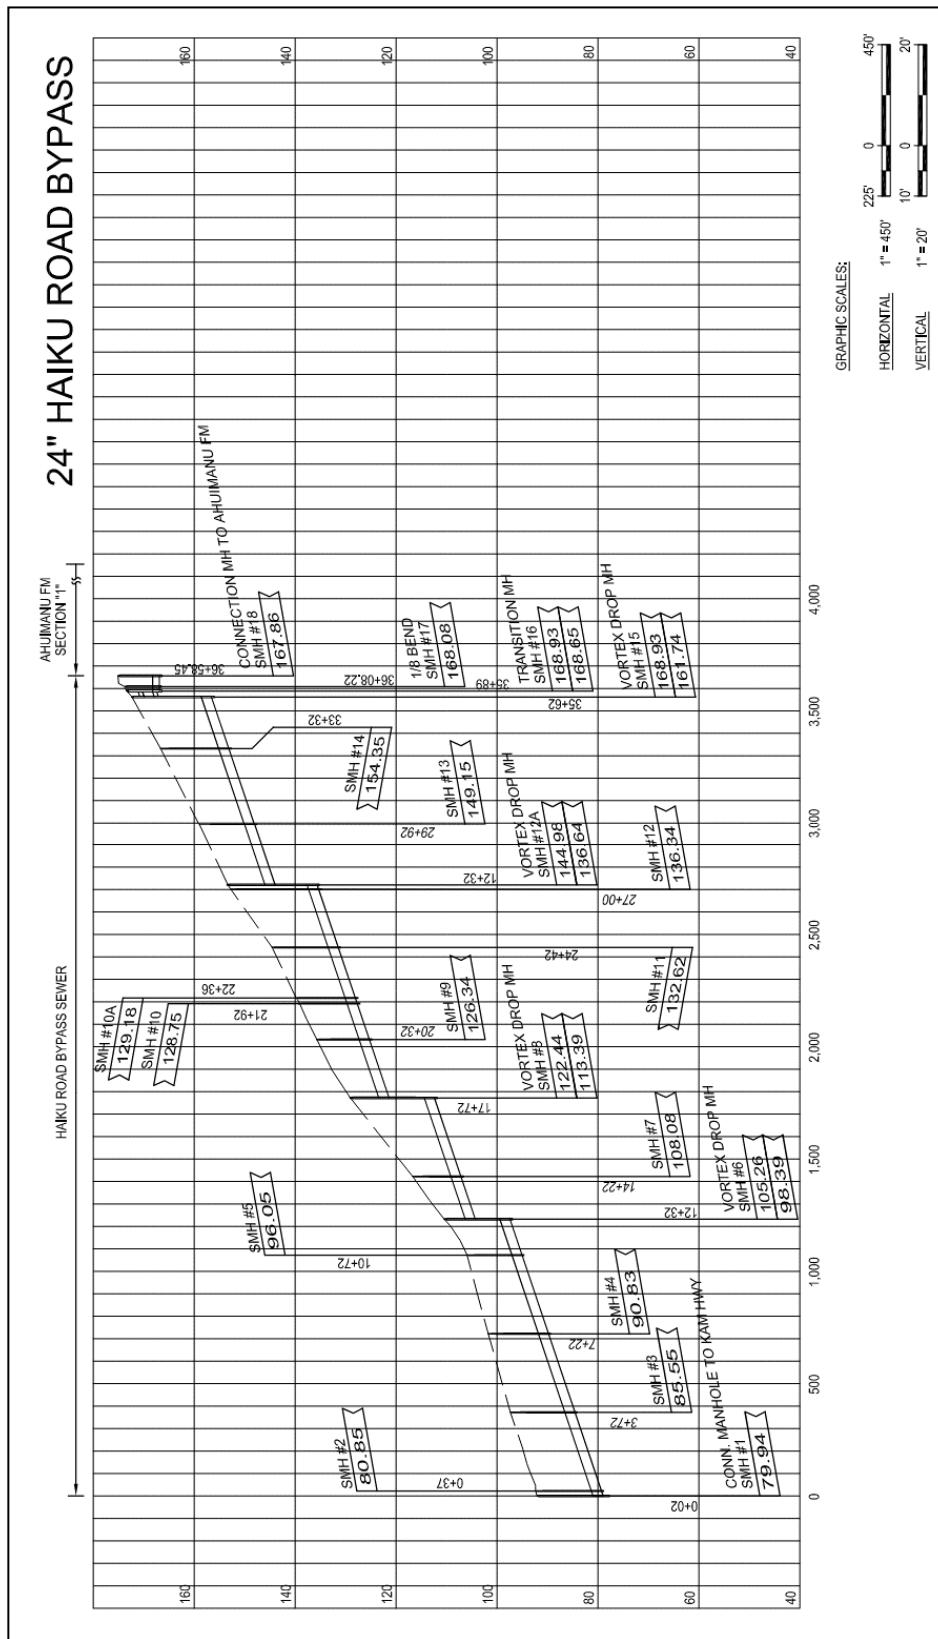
Existing Haiku Road Bypass Sewer
